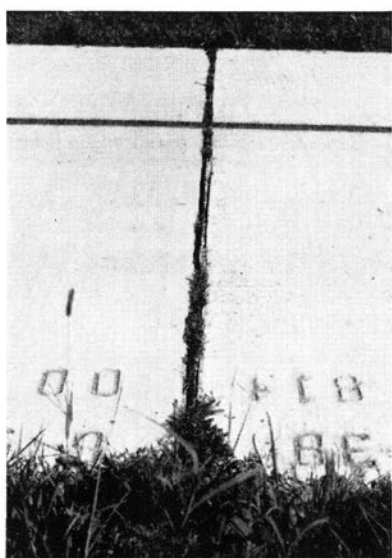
PREFORMED RUBBER EXPANSION JOINT AT STA. 81 + 00, SHOWING WEEDS GROWING IN SOIL COLLECTED BETWEEN LOOSE FILLER AND CONCRETE. RUBBER SHOWS SOME DETERIORATION (AUGUST 25, 1941)
